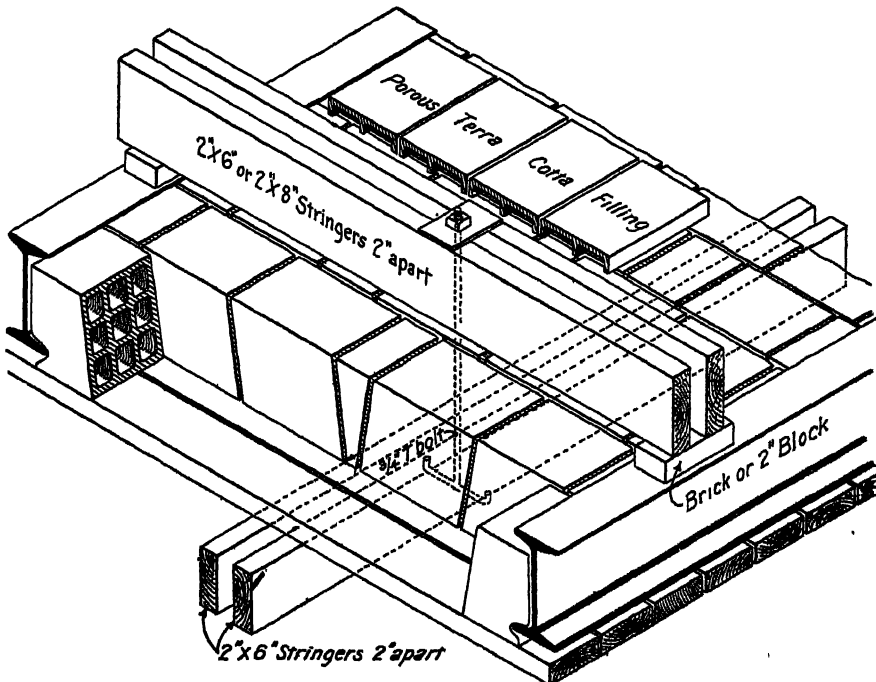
FLAT FLOOR ARCH (END-METHOD CONSTRUCTION).
